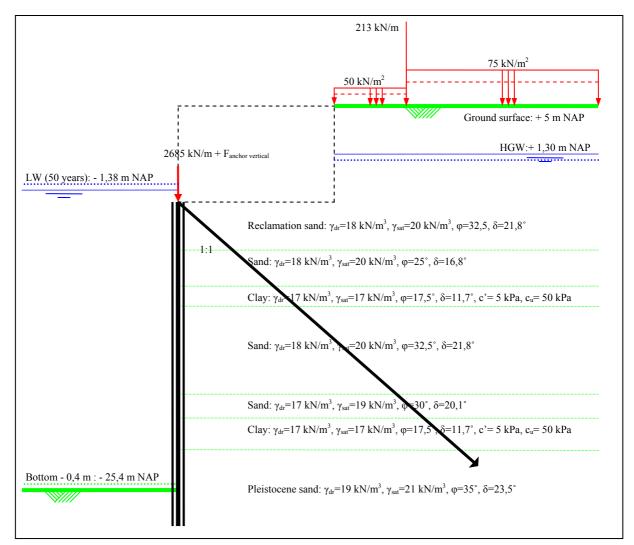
Design values (situation with high groundwater and low free water level) for sheet pile calculation
